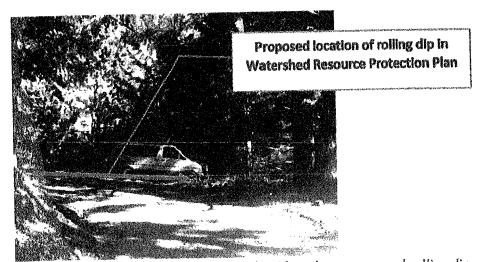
Photograph showing the turn to head north along the ridge where a proposed rolling dip needs to be installed. Road 3 where the grade is Approximately 12%. The road width is 12-14 ft. wide with an inboard ditch and with a shoulder width of 1-3 ft. Also shown is the location of a suggested rolling dip. Installing the rolling dip will break up an inside ditch length of 400 ft.
